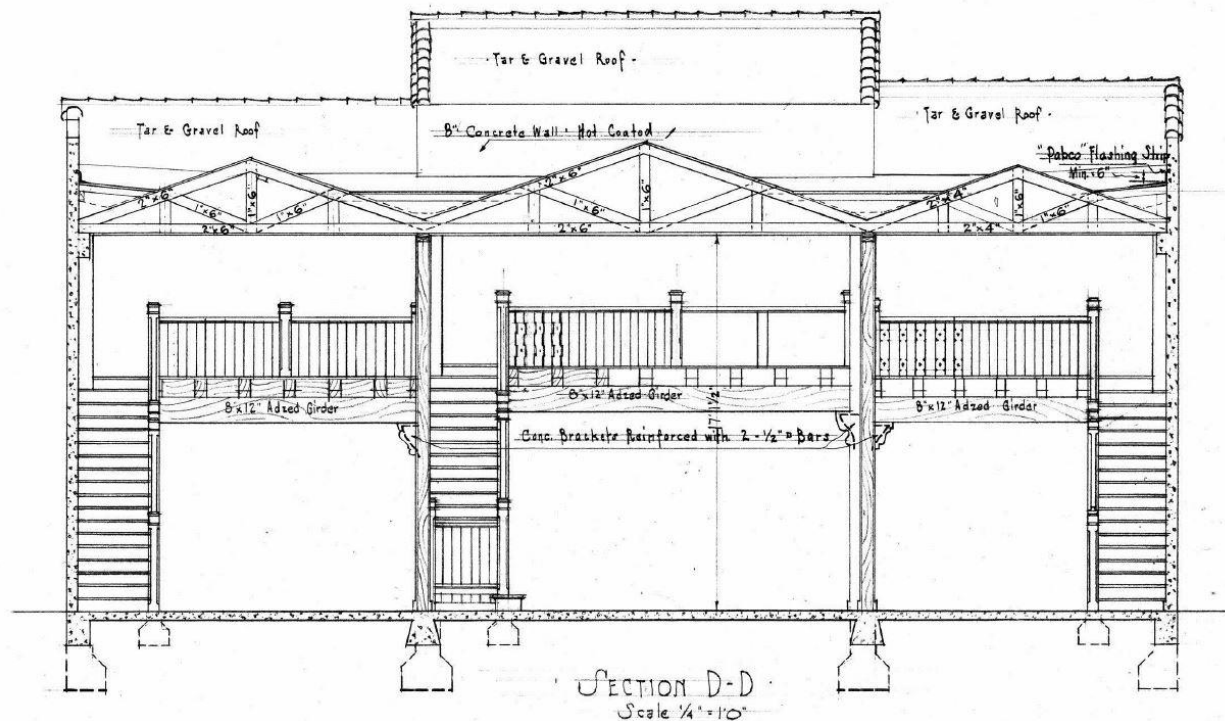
Interior section looking toward front of building from original drawing by Birge Clark showing original mezzanine and stair configuration. Source: Birge M. Clark, "Store Building for Mr. B. J. Hoffacker," Sheet 7 (no date, c. 1927).
